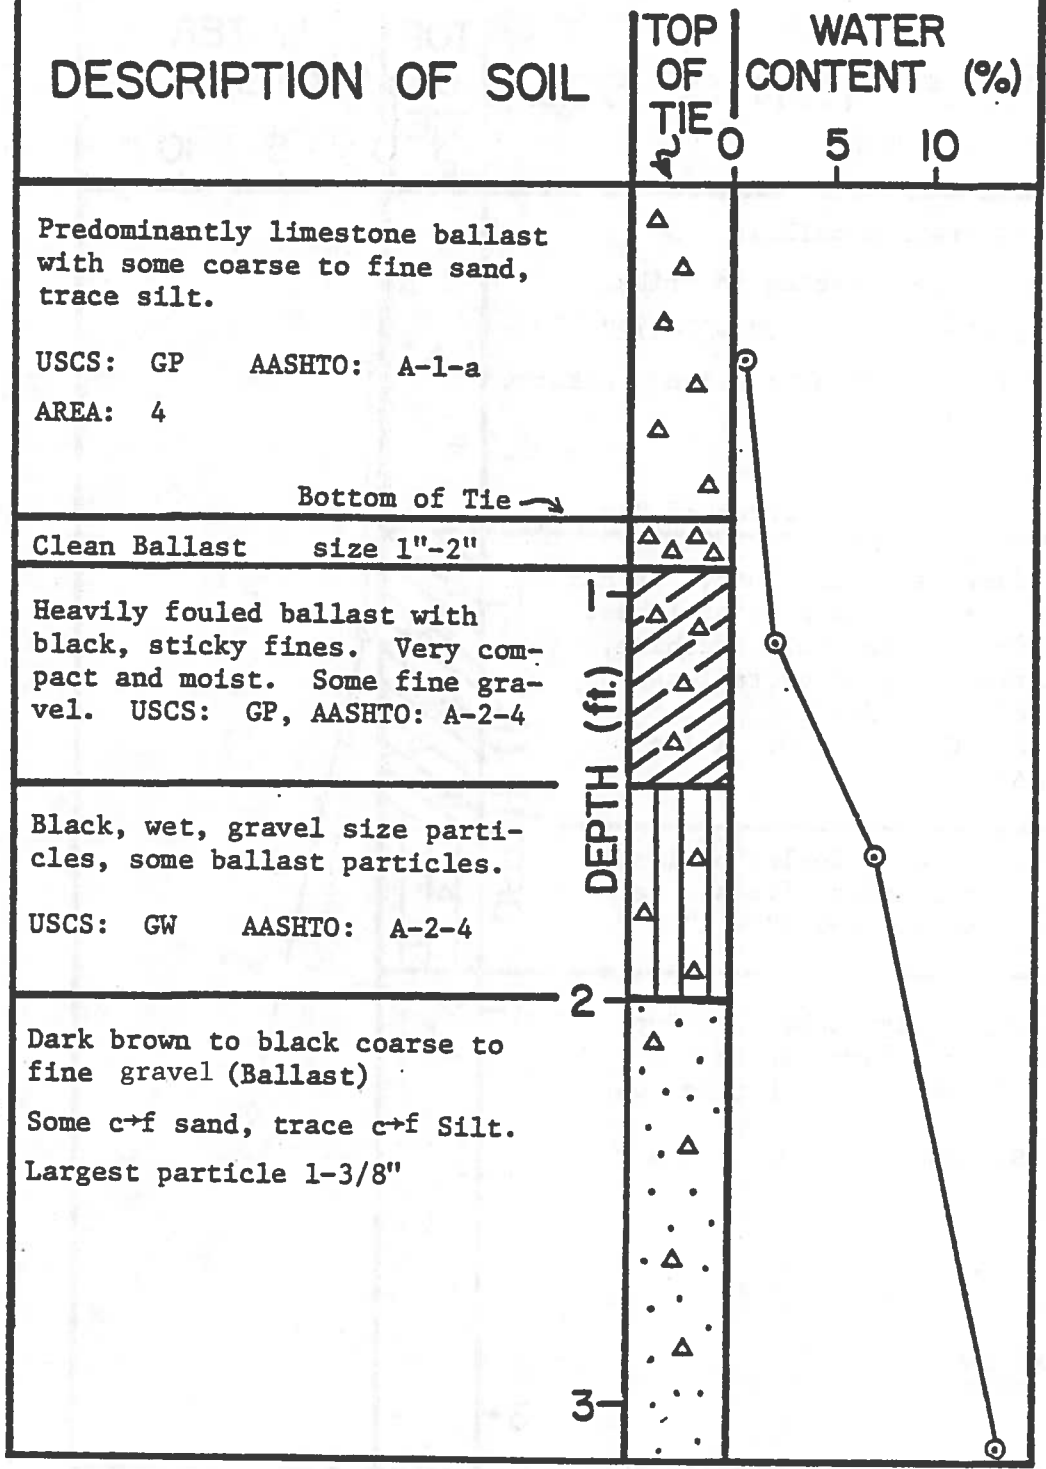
BALLAST PROFILE FOR RICHMOND CONCRETE TIE SECTION
